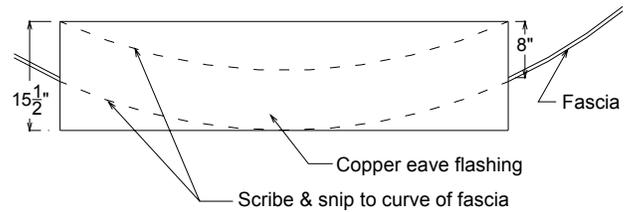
EAVE METAL WITH TURRET SHINGLES ON CURVED EAVES – TOP VIEW
